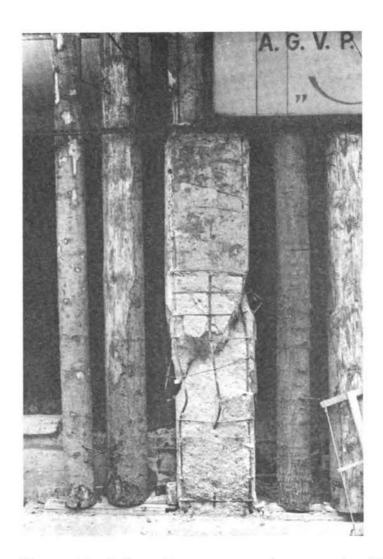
Column in open ground story of tall building designed and constructed before the 1940 Romanian earthquake.
